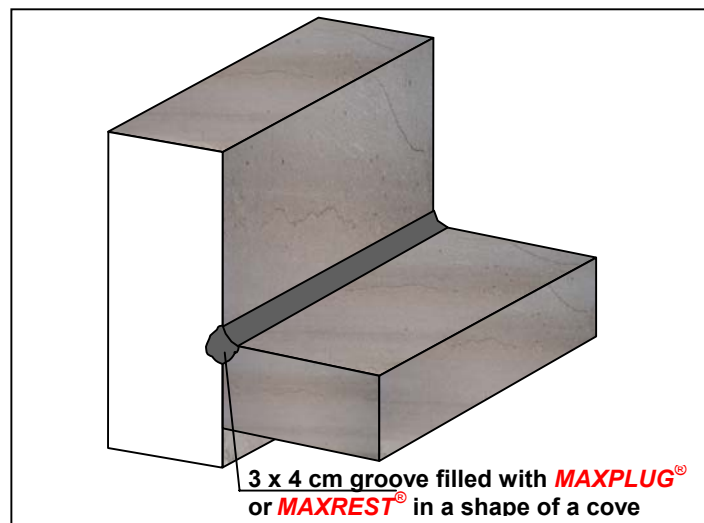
Concave corners (concrete slab-wall joints) treatment
